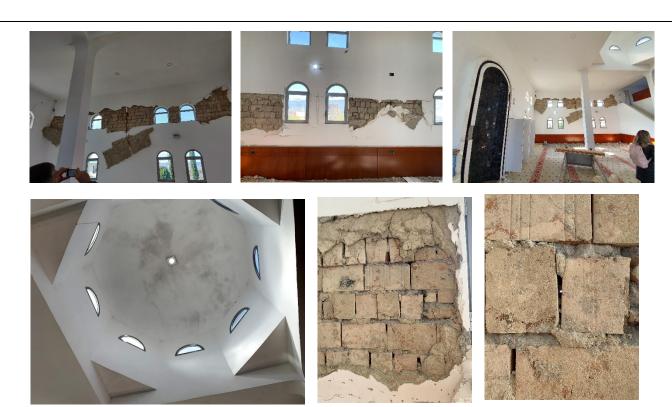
Interior view of the mosque in Thumanë showing damage in masonry walls and the dome (photos: HAEE).
